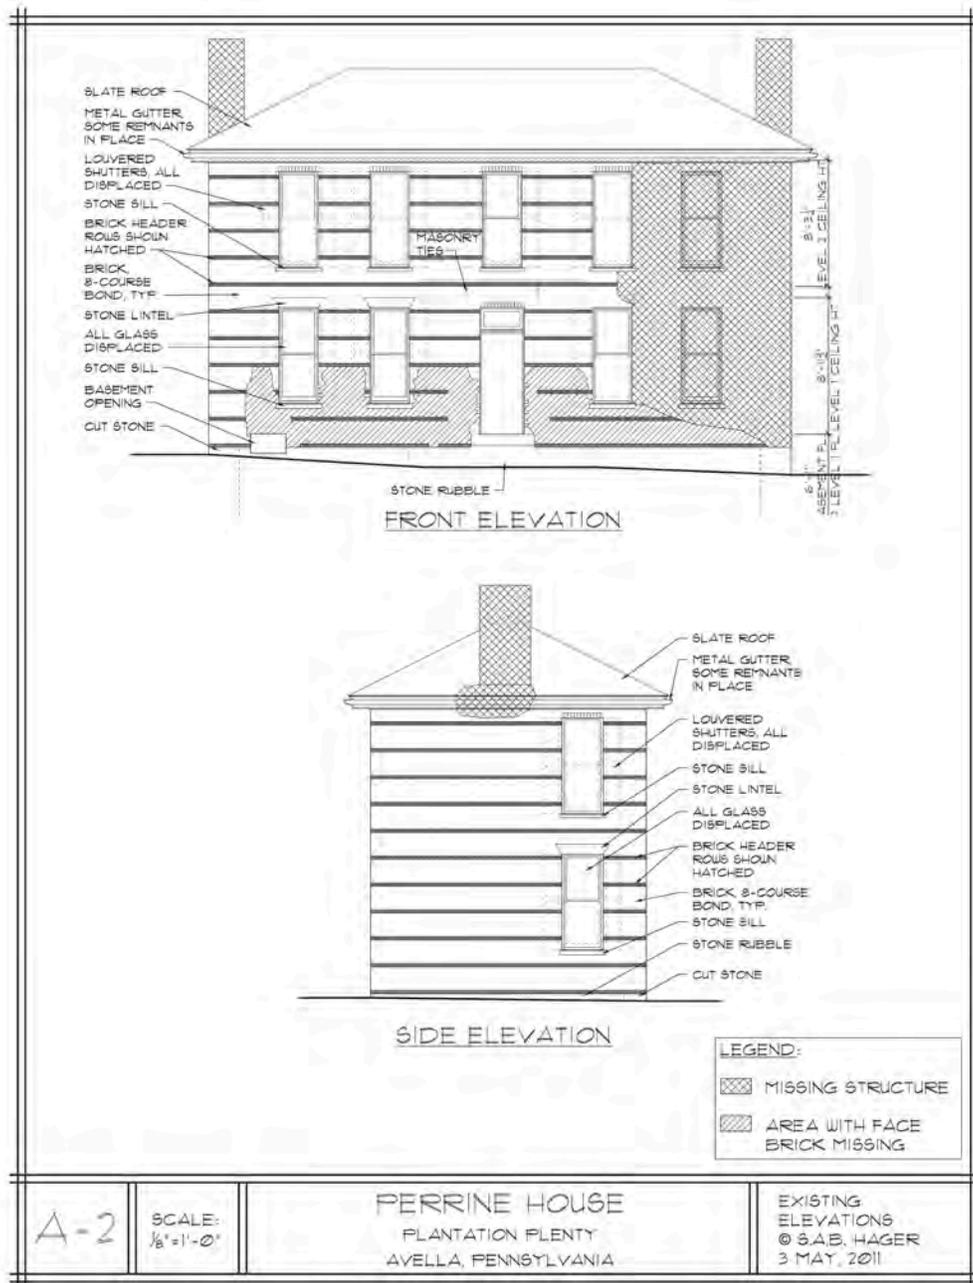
Plantation Plenty Perrin House Façade (front/southwest elevation) and Northwest side elevation
